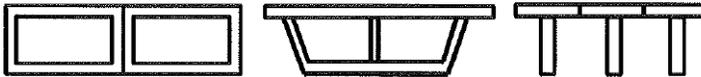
Reinforced Concrete / Pre-stressed Concrete Girders
